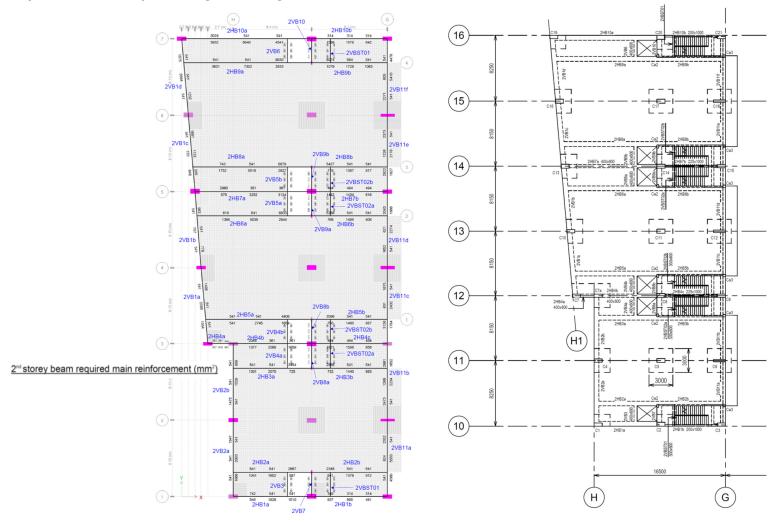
Summary of beam design with the beam labels in one plan (same as structural plan)
